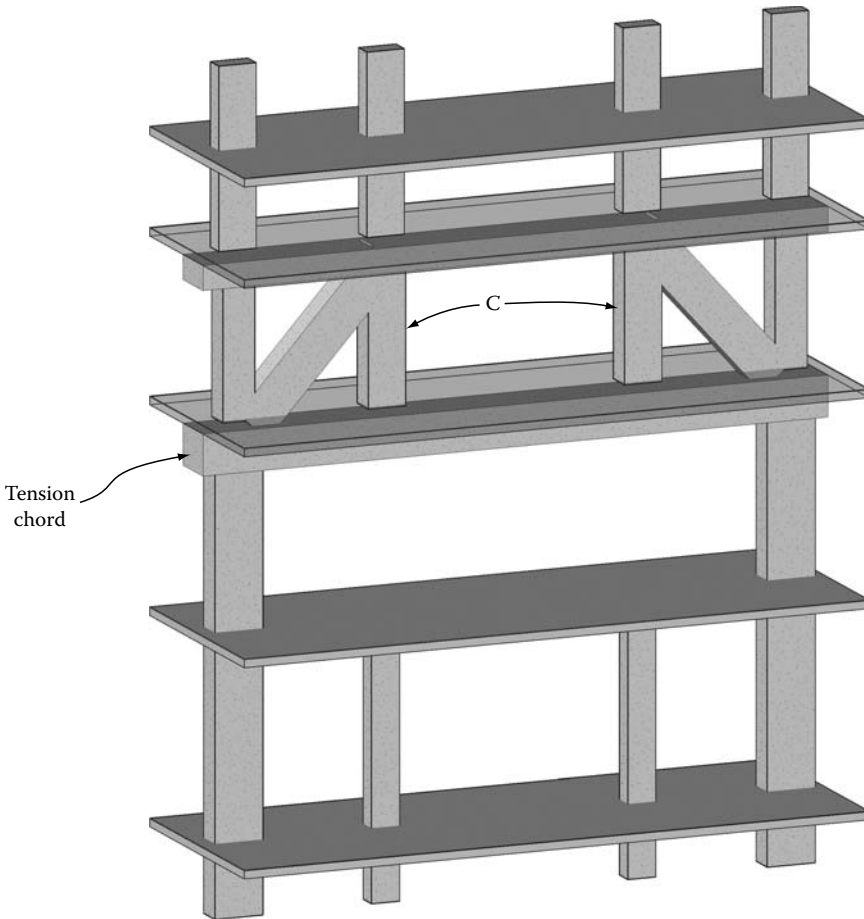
Tension member in a transfer truss. *Note:* Column C not required for truss action but recommended.
